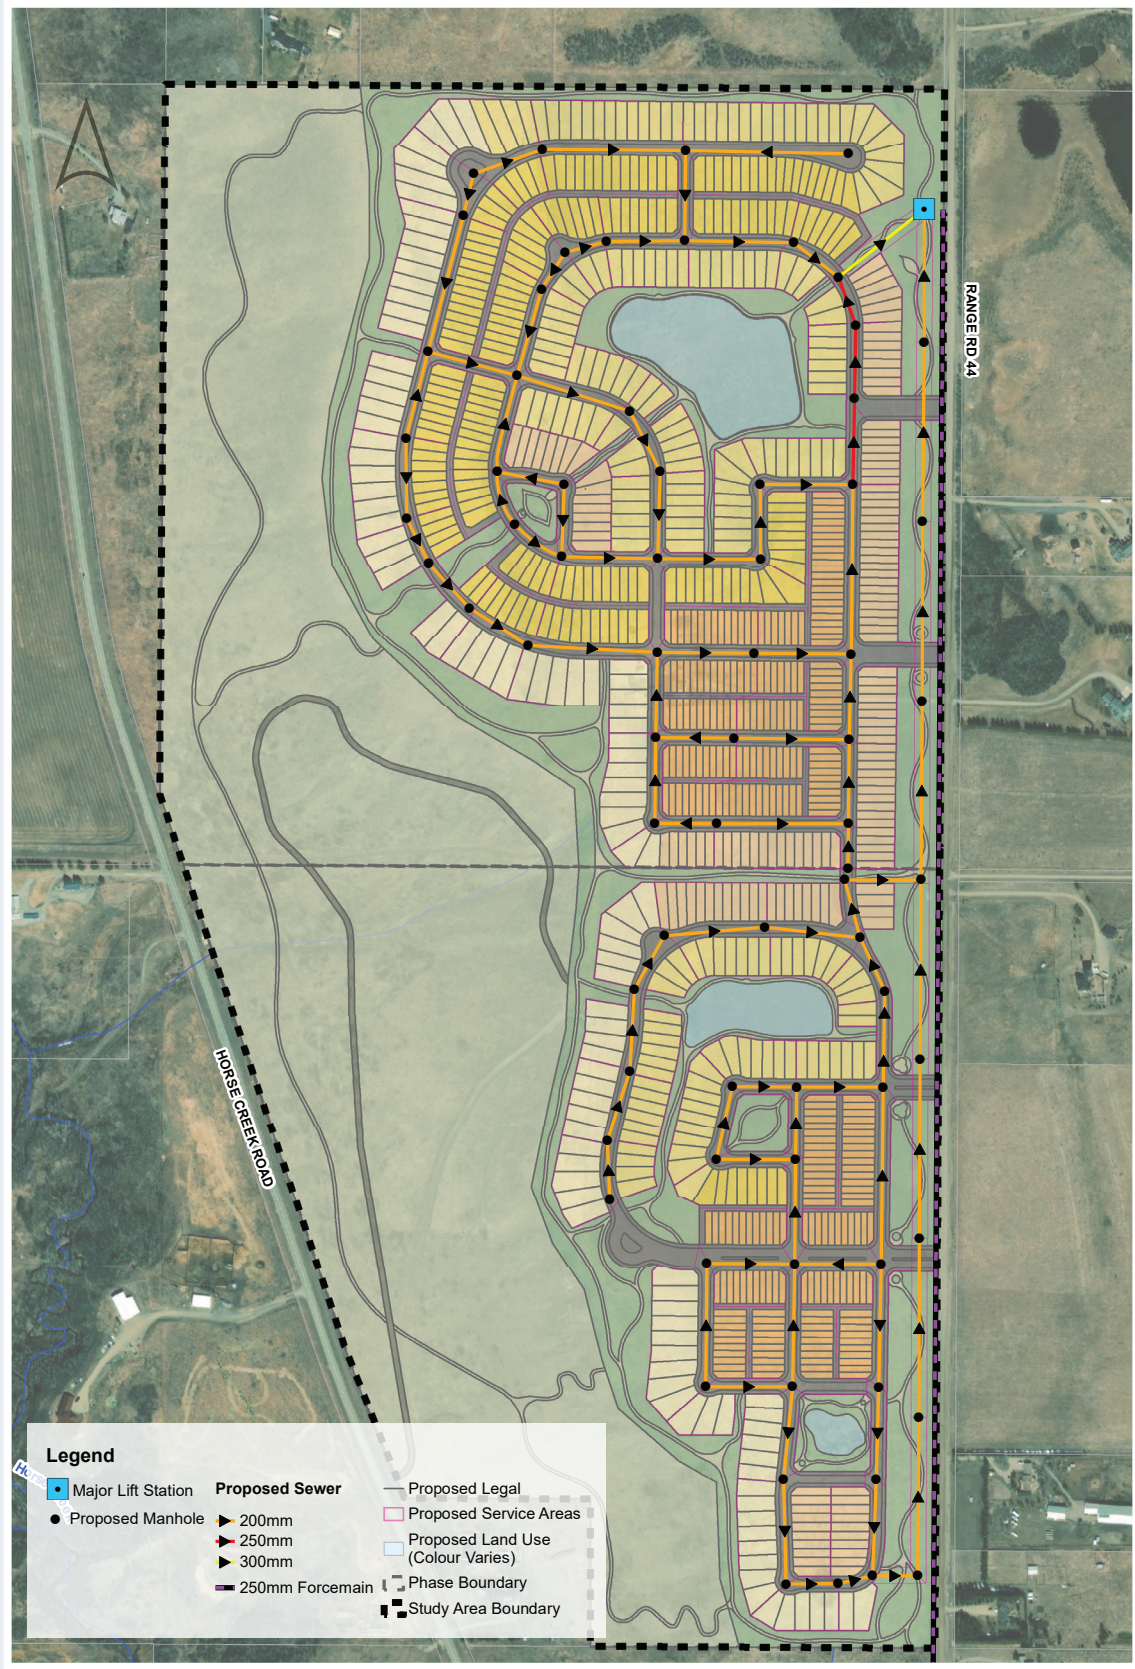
Wastewater Servicing Plan Scenario 1, Plan Area
